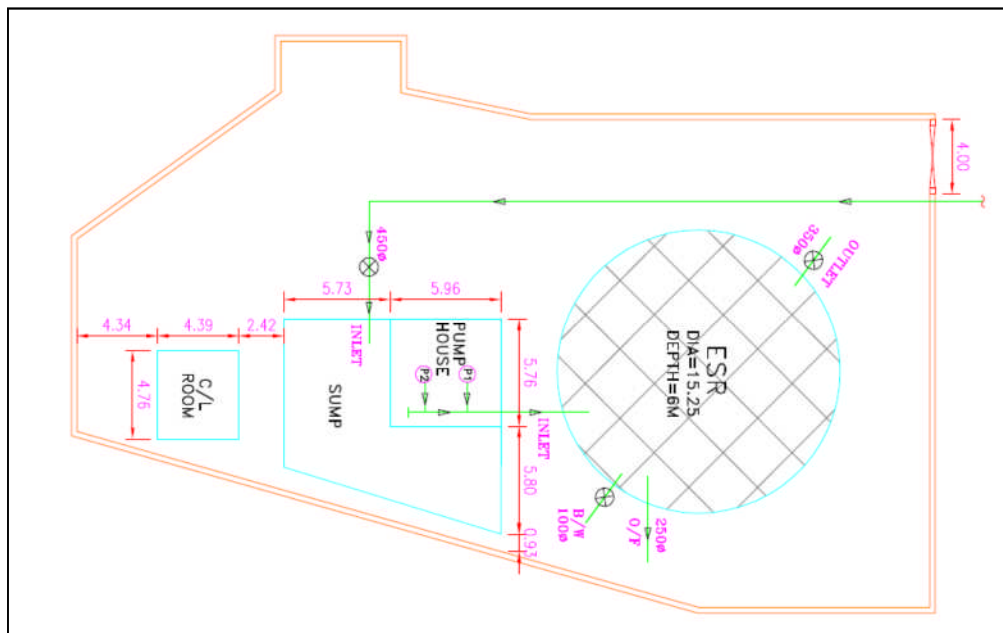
Plant Layout for Nirbhay Nagar ZPS
